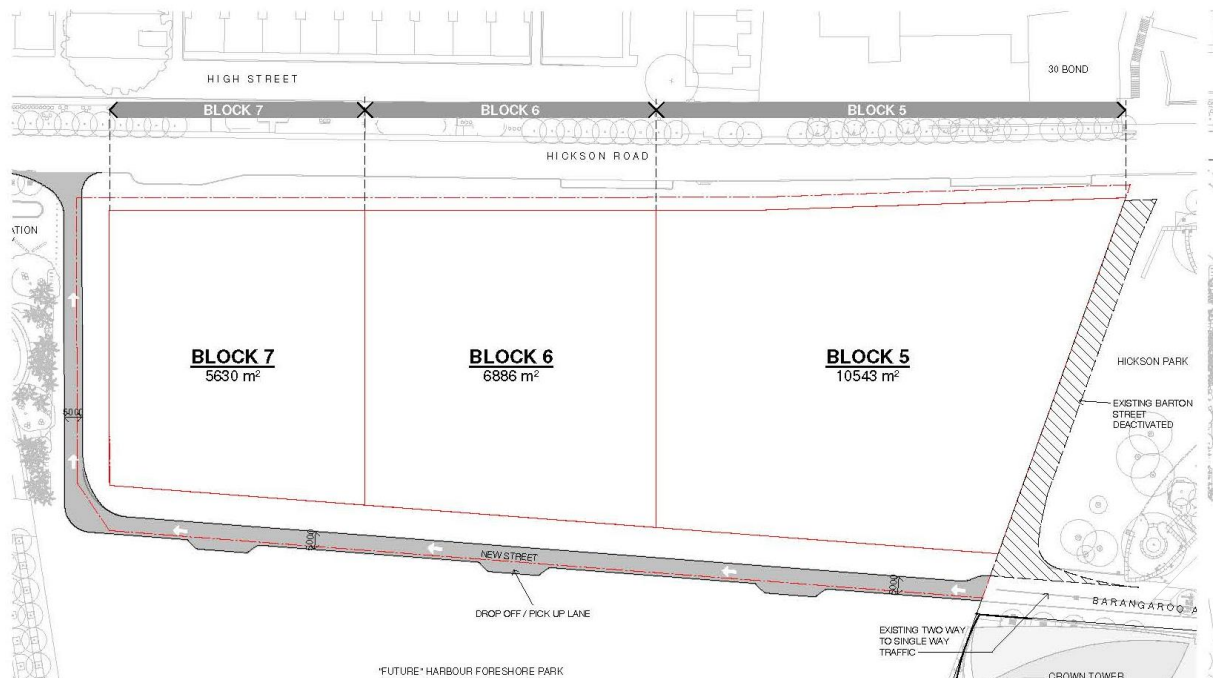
The proposed development blocks for Central Barangaroo under the amended proposal.
